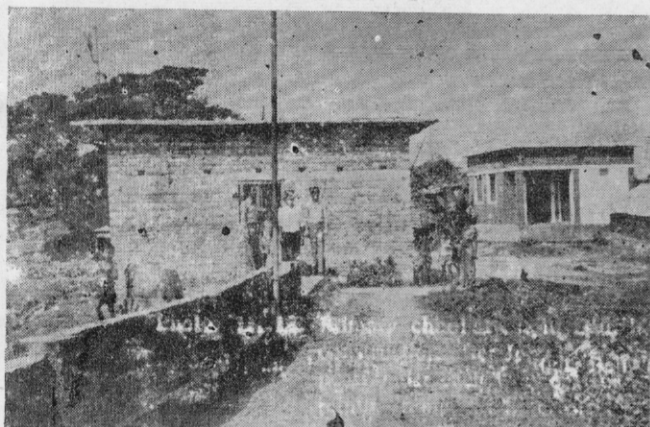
Government Primary School, Khilgaon, Dacca, Bangladesh. Building at left with timber post-truss construction, aluminium sheet roofing and GI cladding. Building at right with wooden rounds posts, GI sheet roofing and bamboo mat cladding.
